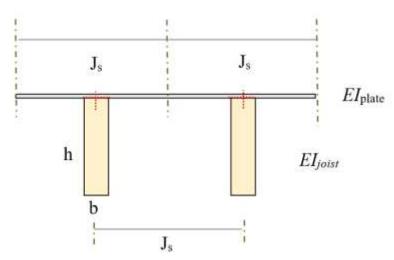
Joist spacing gives distribution of the longitudinal stiffness, of a T-cross section with a stiff connection (glued + screwed) connection.
